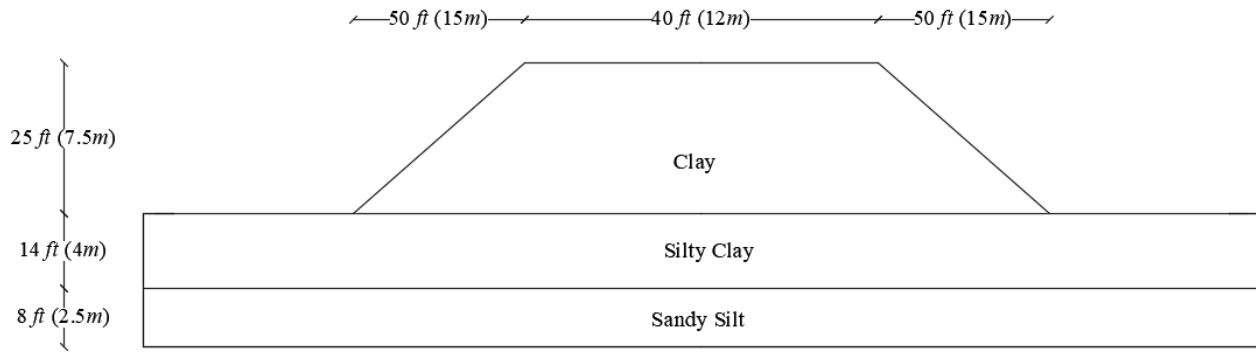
Soil profile at Clinton bridge site (Laguros et al. 1991)
